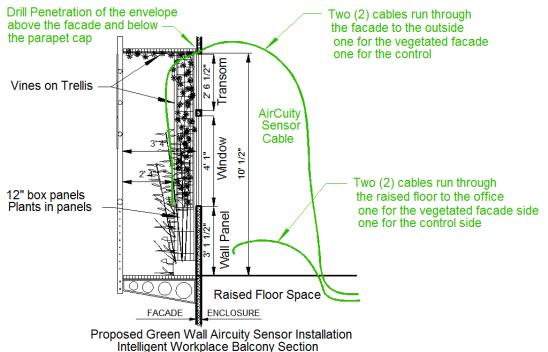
West Façade Research Bay Building Envelope Section showing outdoor and indoor Aircuity sensor locations, Leininger, 2013
